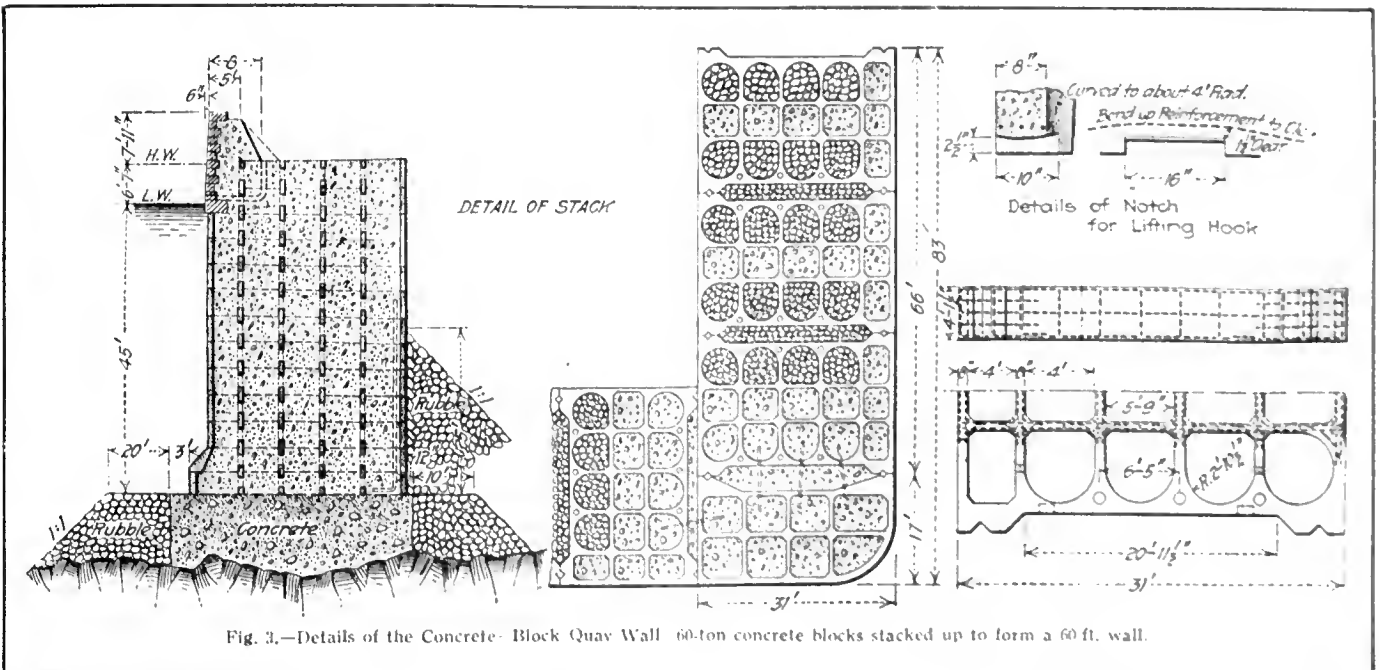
Details of the Concrete-Block Quay Wall 60-ton concrete blocks stacked up to form a 60 ft. wall.
